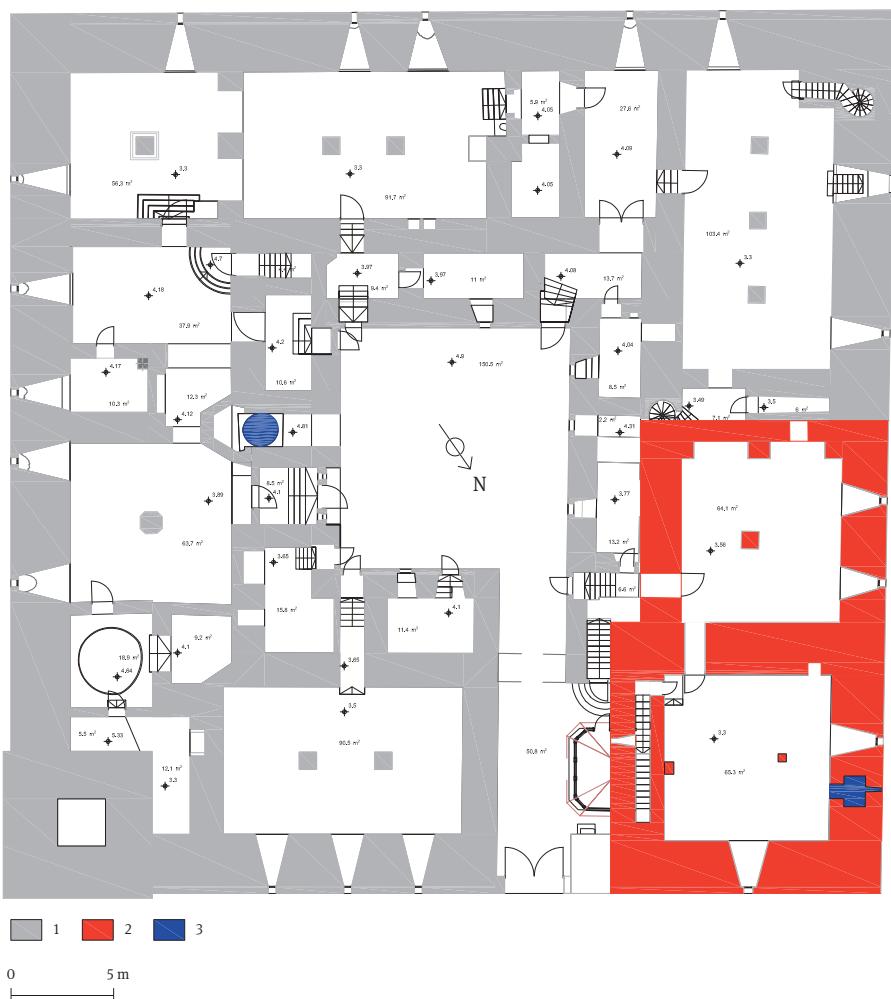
Ground plan of the cellar storey of Kuressaare Konventhaus. 1 – walls of the cellar storey, 2 – building volume preceding the Konventhaus: the Sturvolt tower and a single-room auxiliary building, 3 – the well found in the Sturvolt tower wall and a larger circular well in the Konventhaus.
